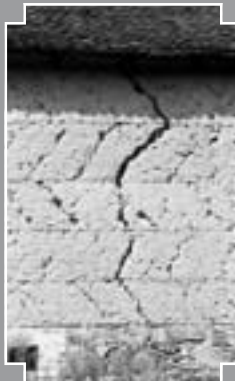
Barn with cracked walls due to subsoil setting (C. Ziegert).
